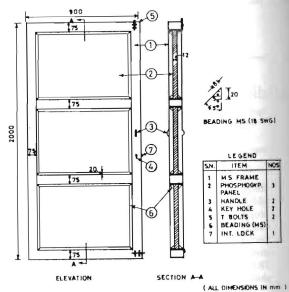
Sisal fibre reinforced gypsum binder door shutter
